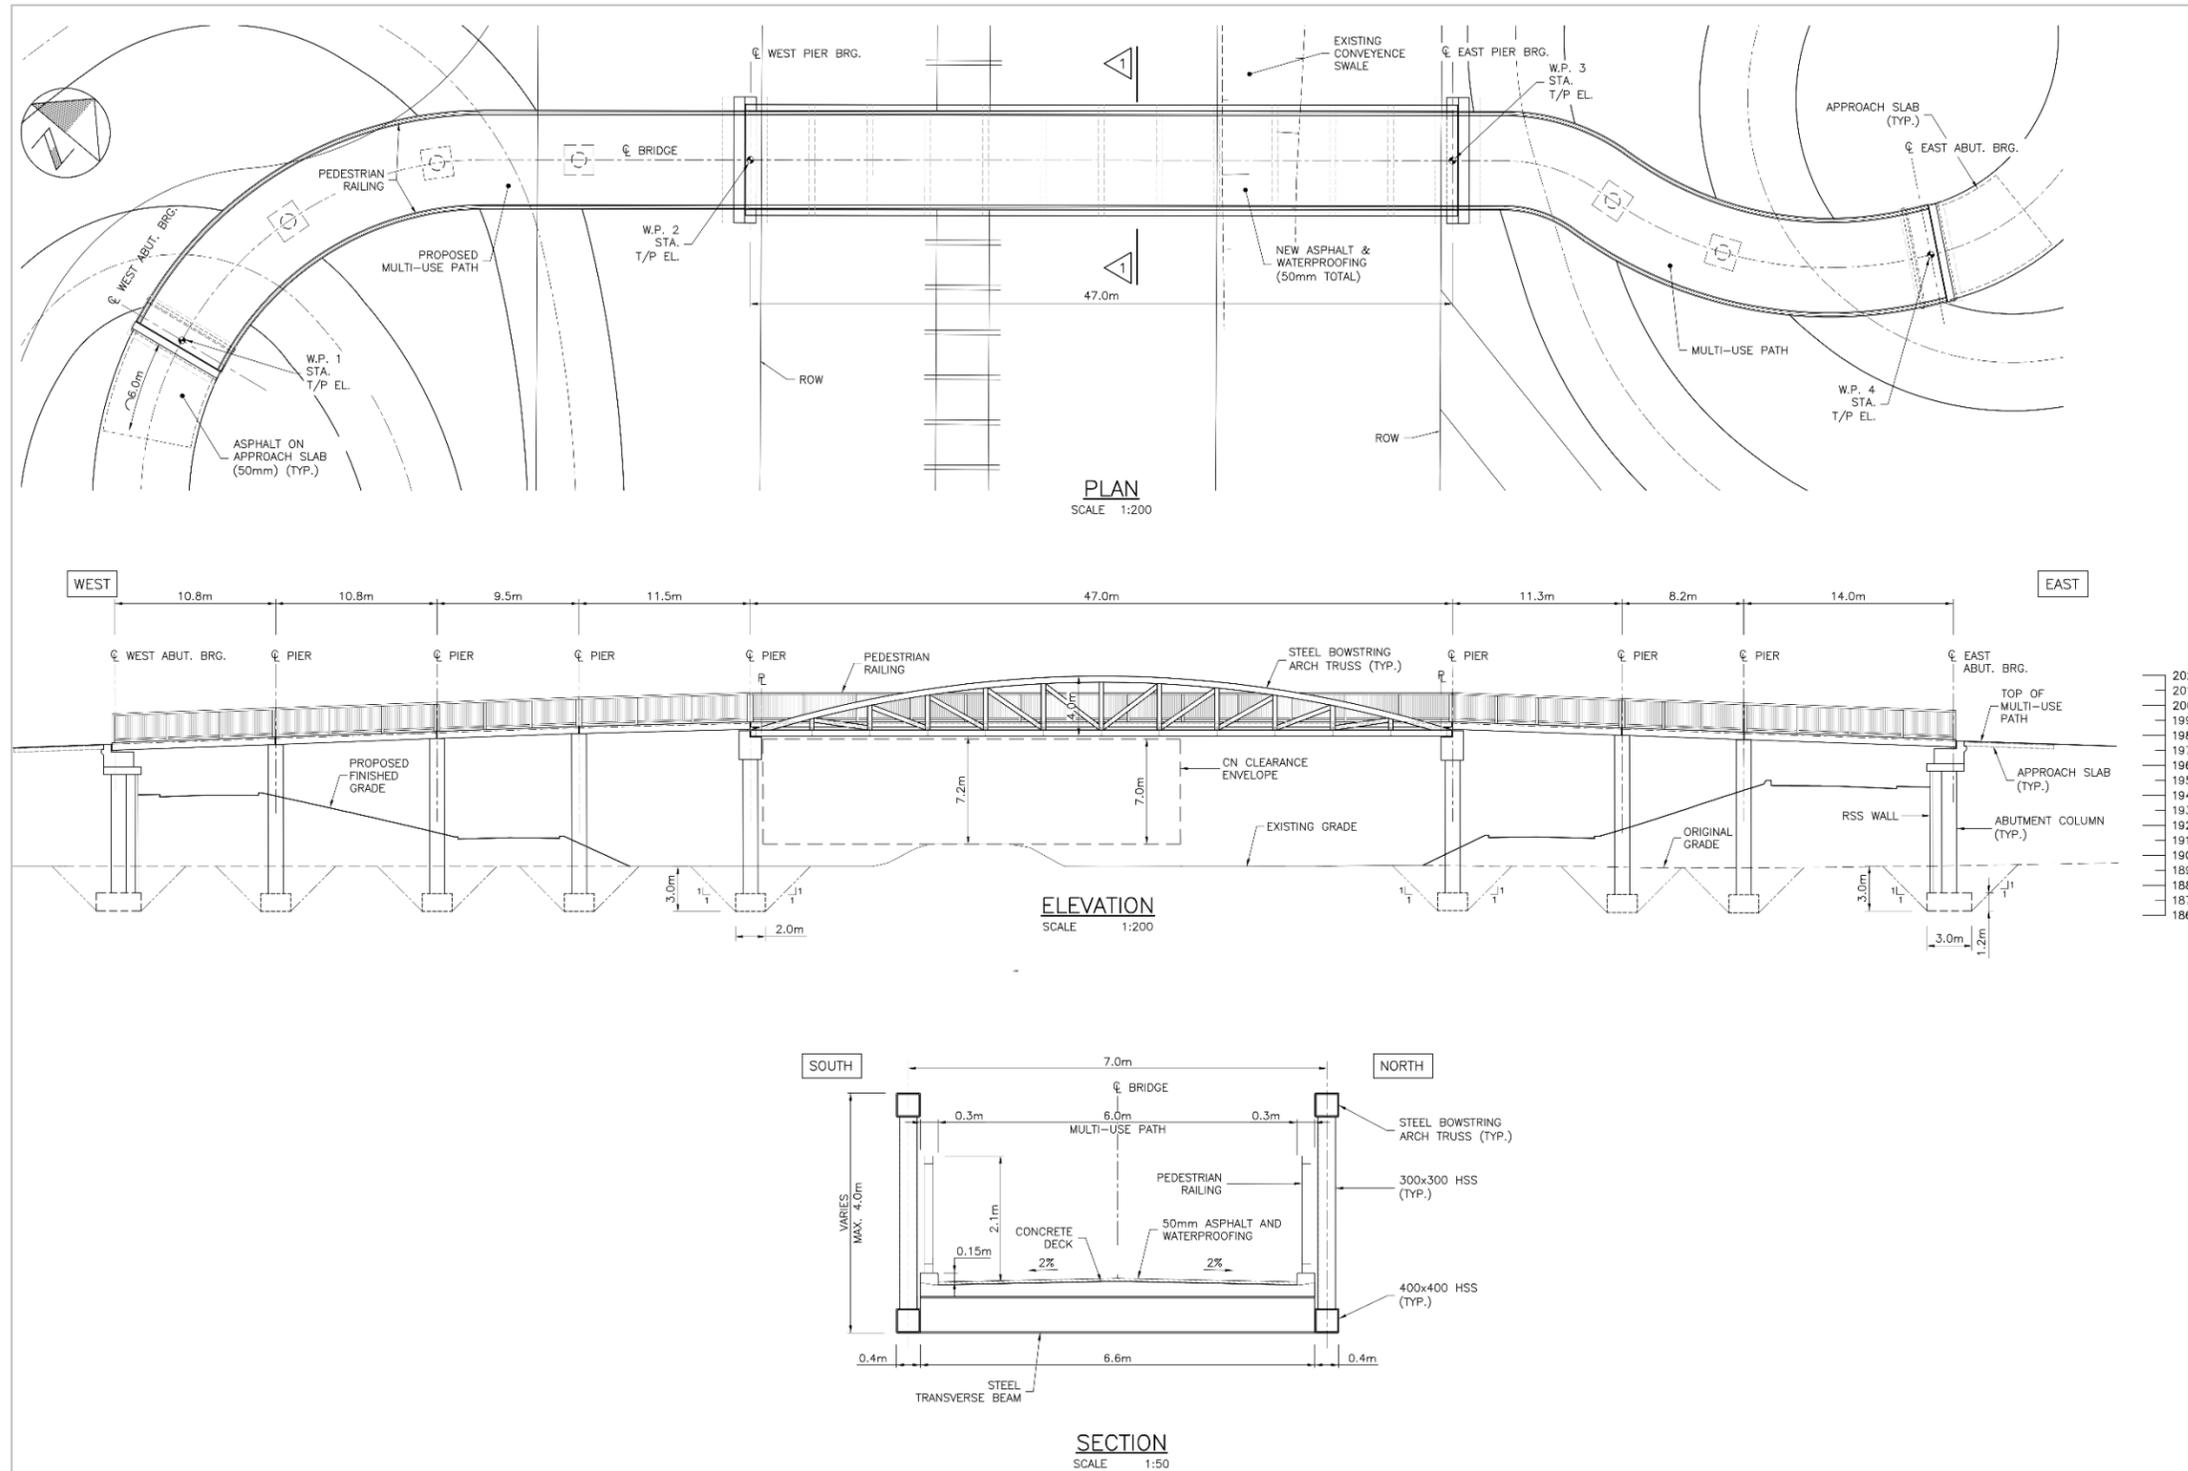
Bridge Structure Alternative A2: Bowstring Truss Bridge with Approach Alternative 2, 3 or 4
